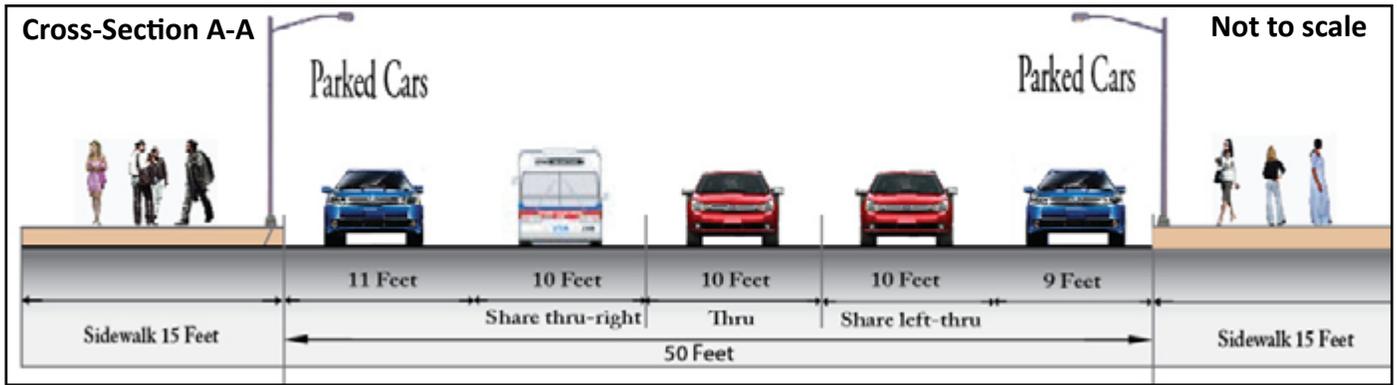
West 66th Street between Amsterdam and West End Avenues (Existing Condition)
